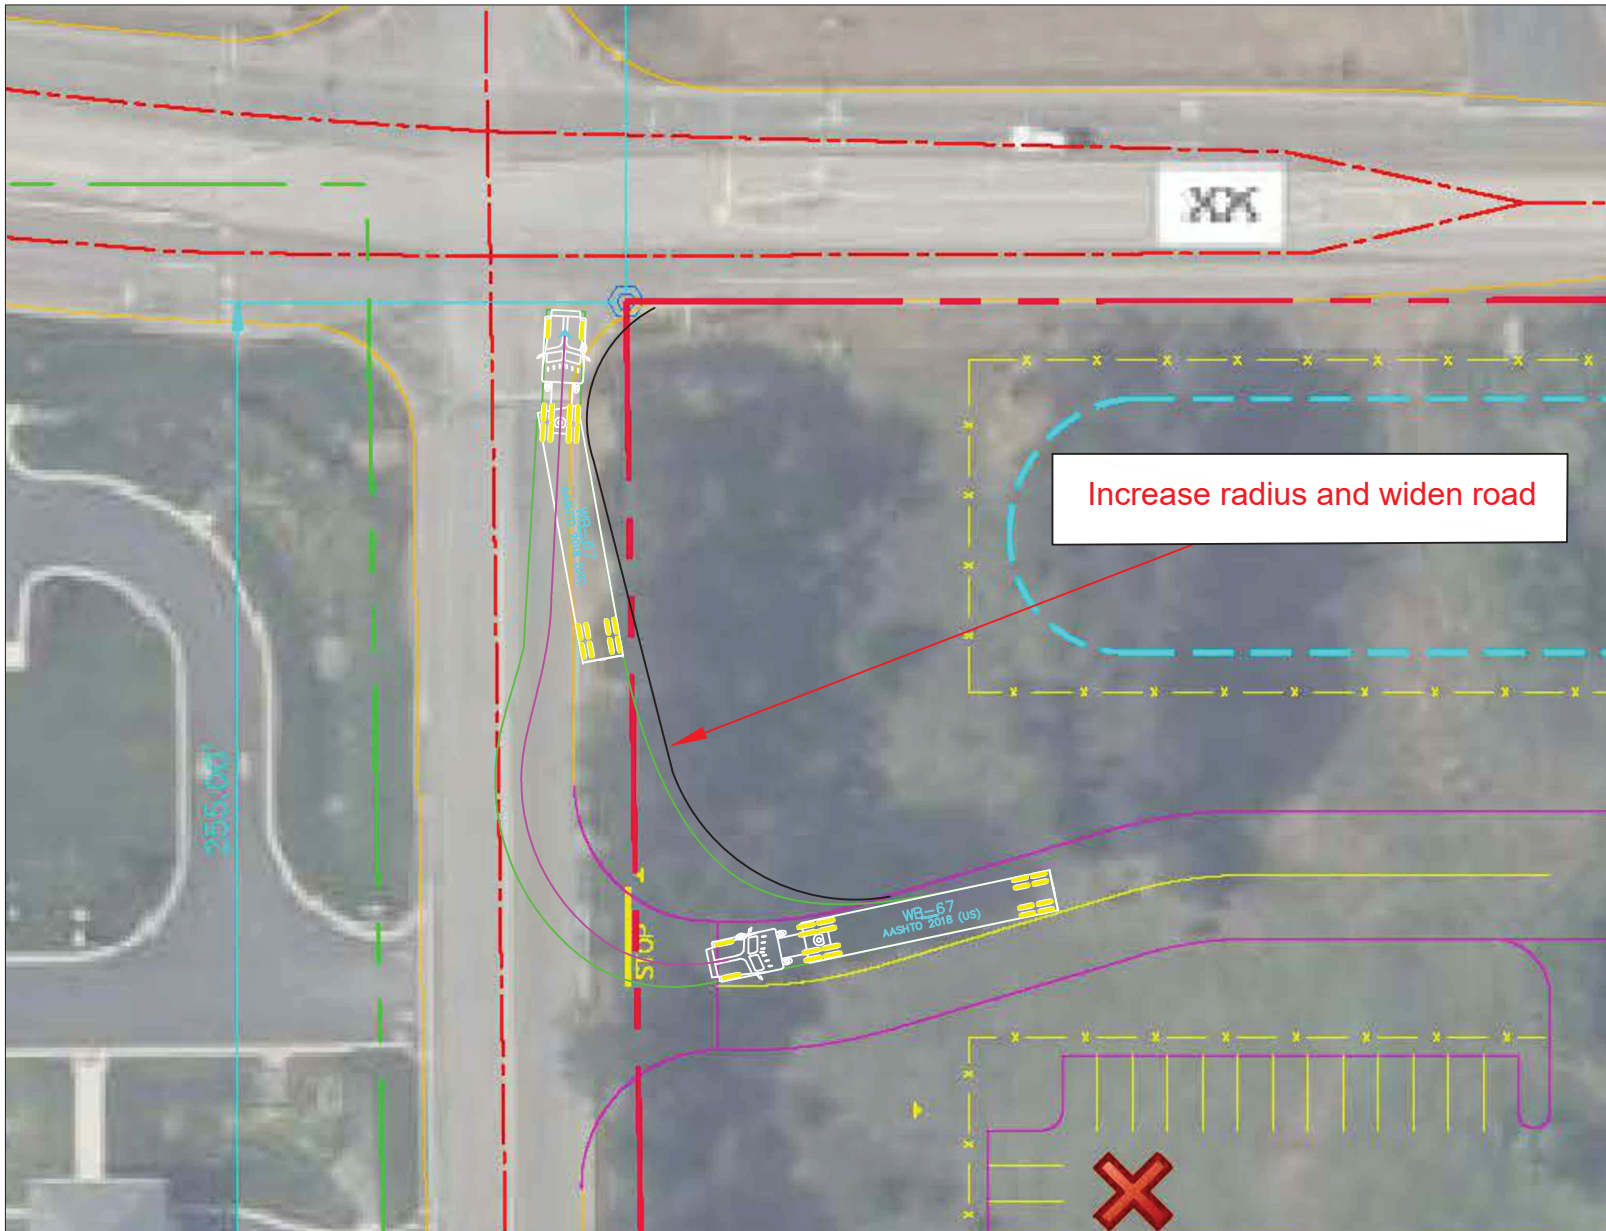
TRAILWOOD AT NORTH DRIVEWAY
